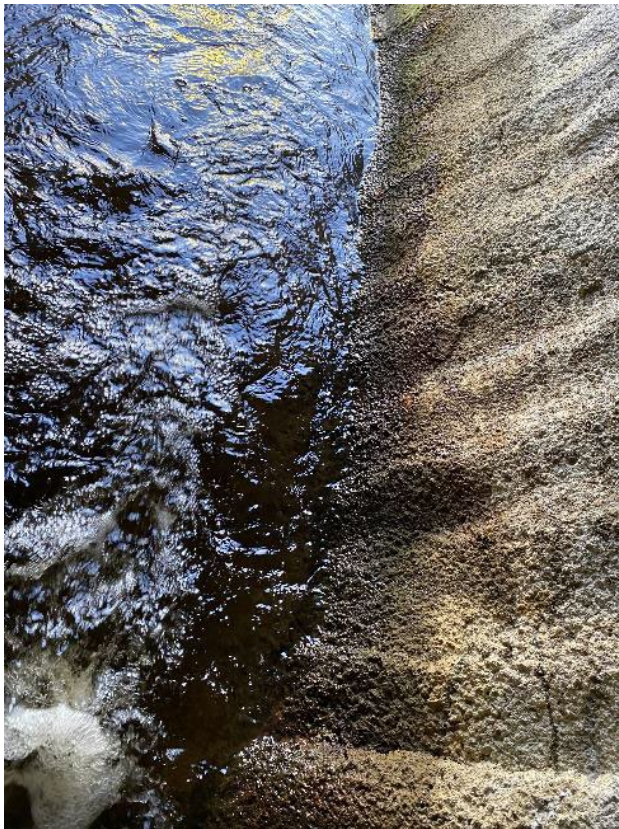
Woodford BR18 Spray On Liner: Staining along invert (left), Cracking along Outlet Mitered edge (right) (2021)
